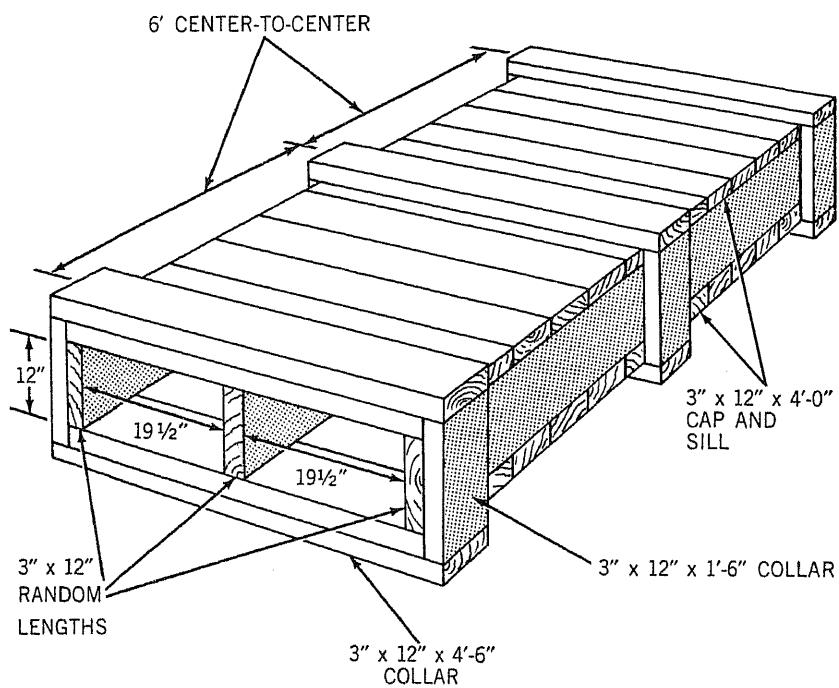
Double box culvert, 19 1/2- by 12-inch.
